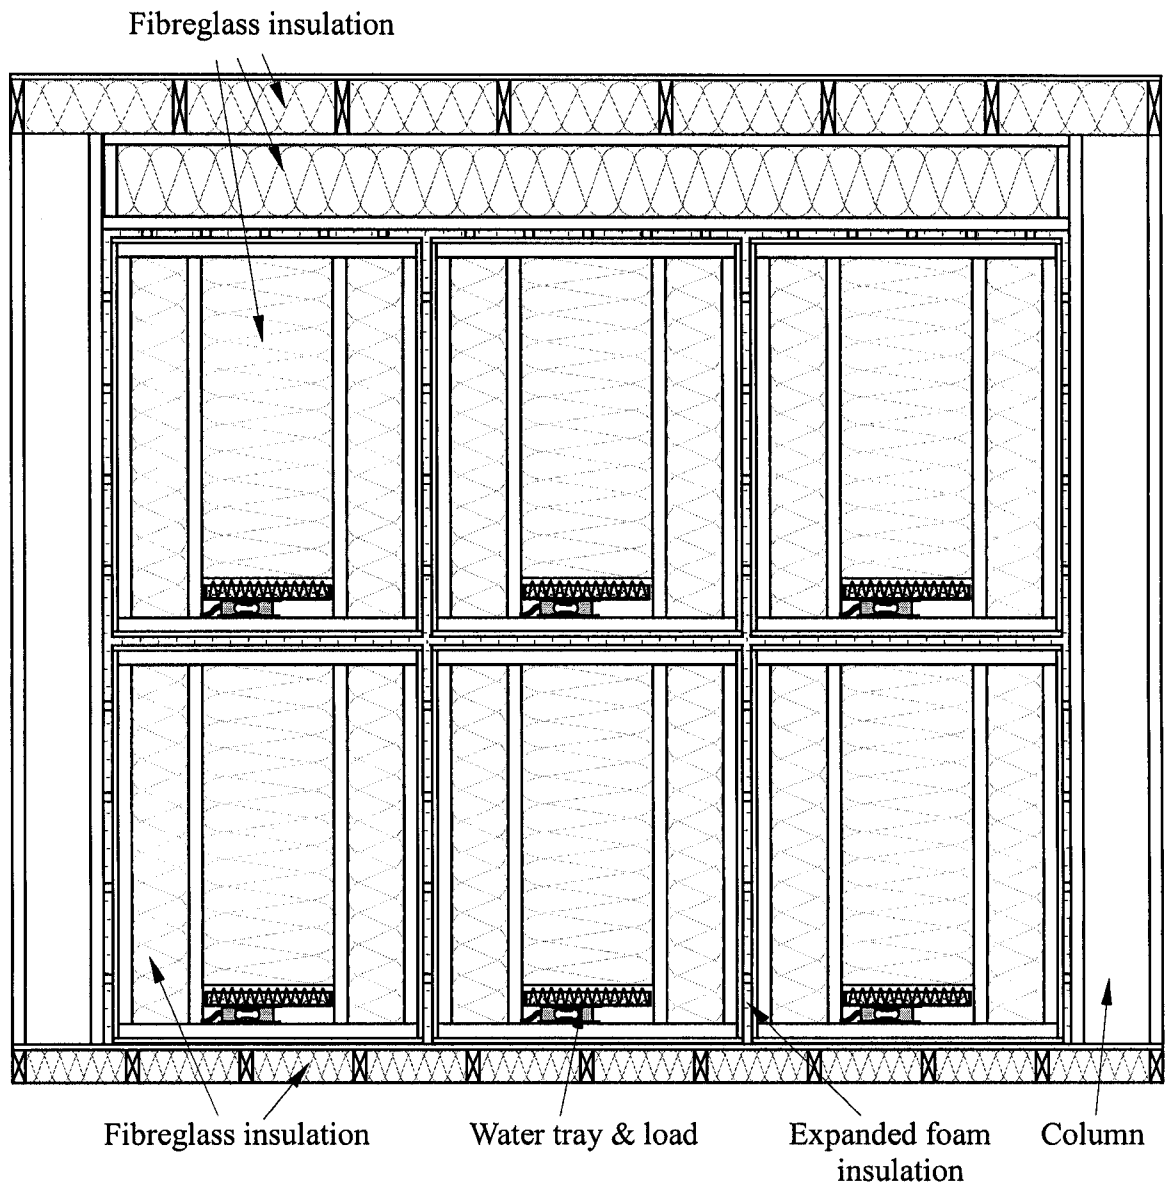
Cross-section elevation of the test wall (from exterior side view)
